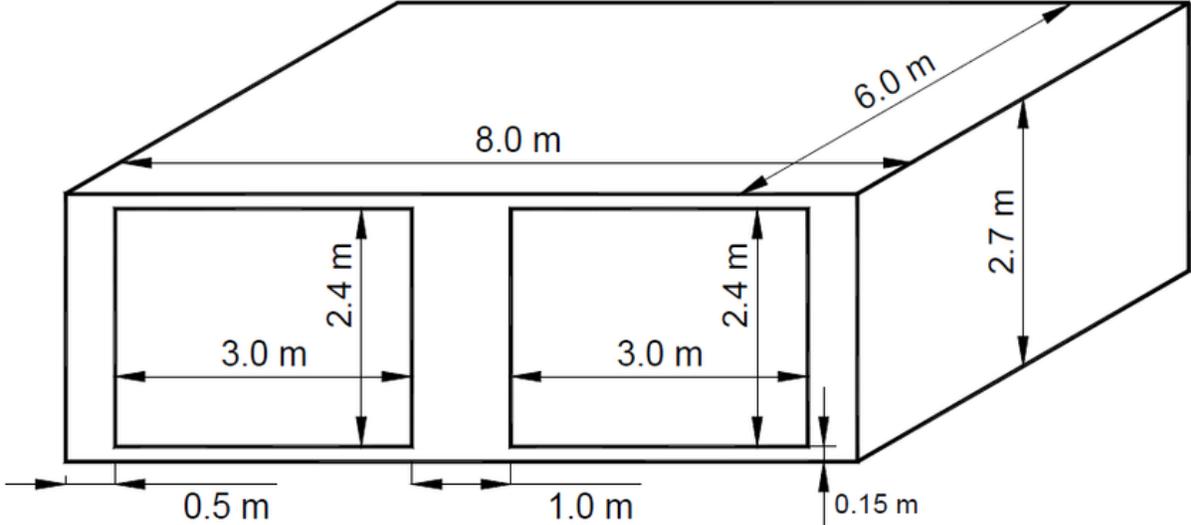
Isometric South View: Base Building Case 600 showing South Wall Glazing.
